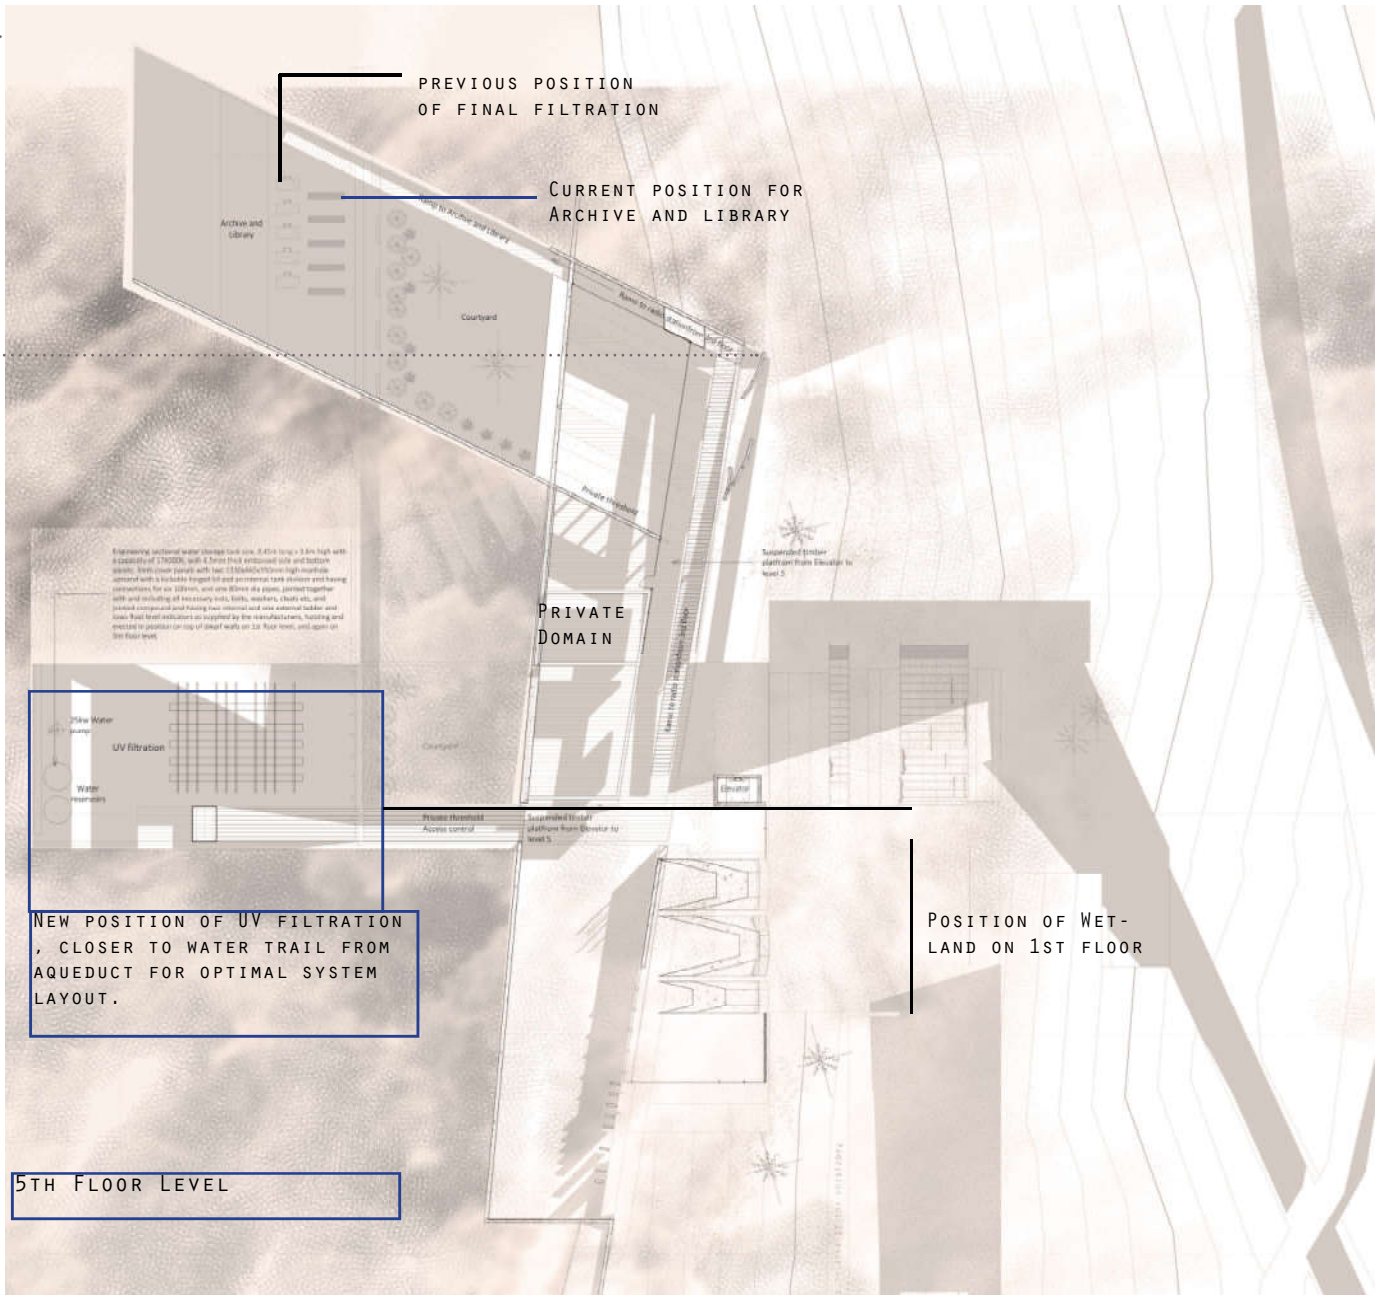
SHOWING 5TH LEVEL FLOOR PLAN
